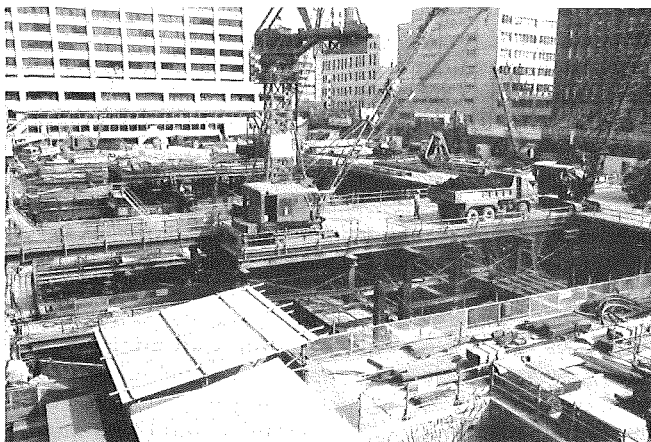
Instrumented Building Foundation Excavation in Japan
